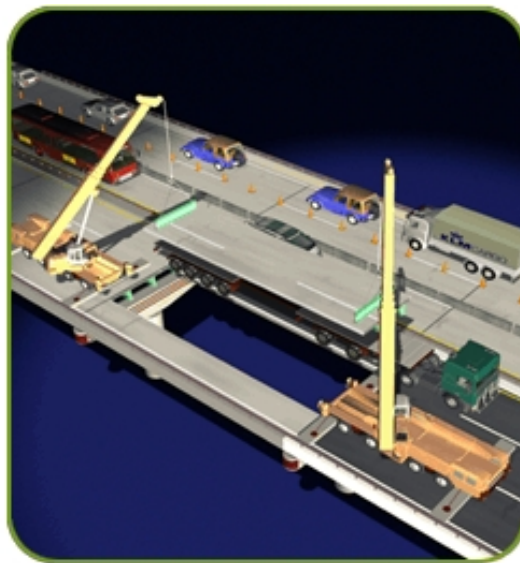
Lifting of Prefabricated Segments for the James River Bridge
